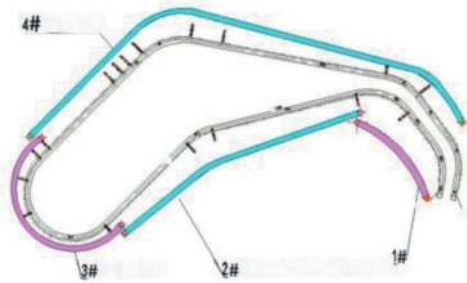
Layout diagram of the technical scheme of the belt machine slagging system of one project.
